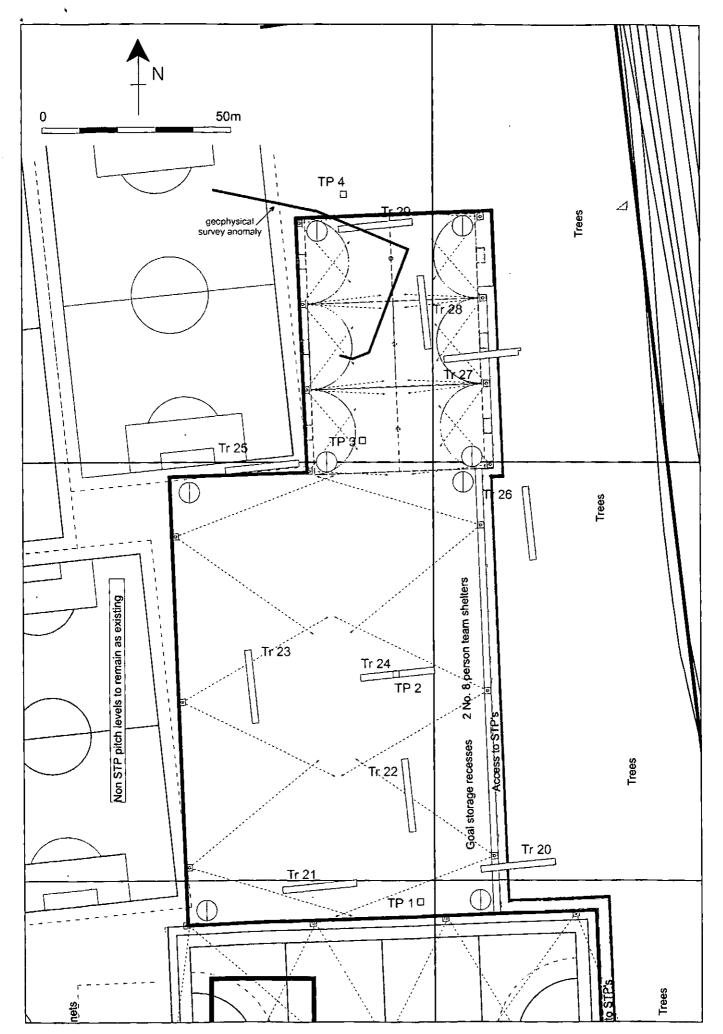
Location plan, Trial pits 1-4 and Trenches 20-29
